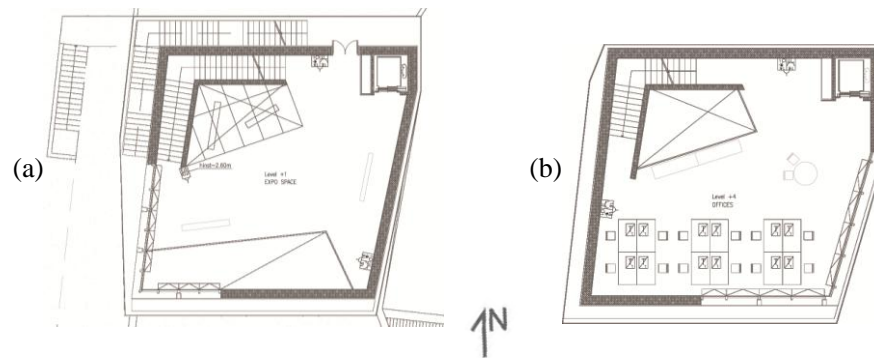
(a) Ground floor plan (b) Third floor plan, Source: MCA
